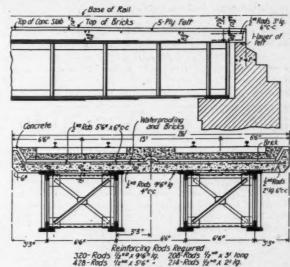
Reinforced Concrete Floor Slab-Deck Girder Spans.
